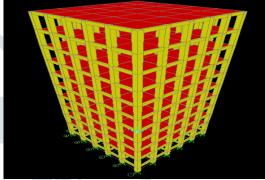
10 Storied Building Without Water Tank – 3d View
